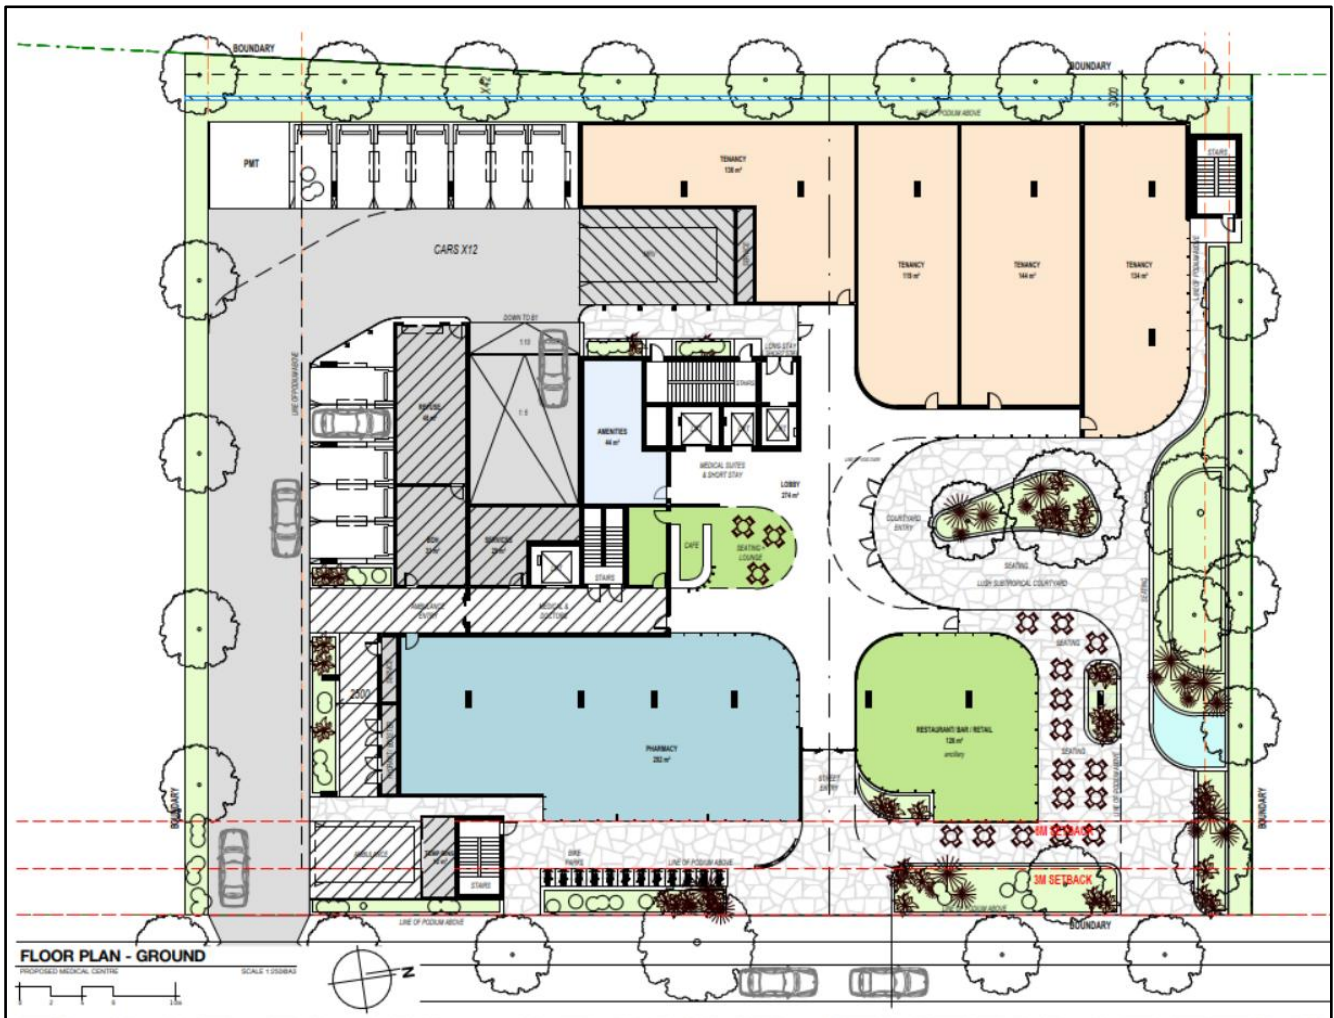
GROUND FLOOR PLAN (BURLING BROWN DRAWING: CUR01-SK-23-DA1)
